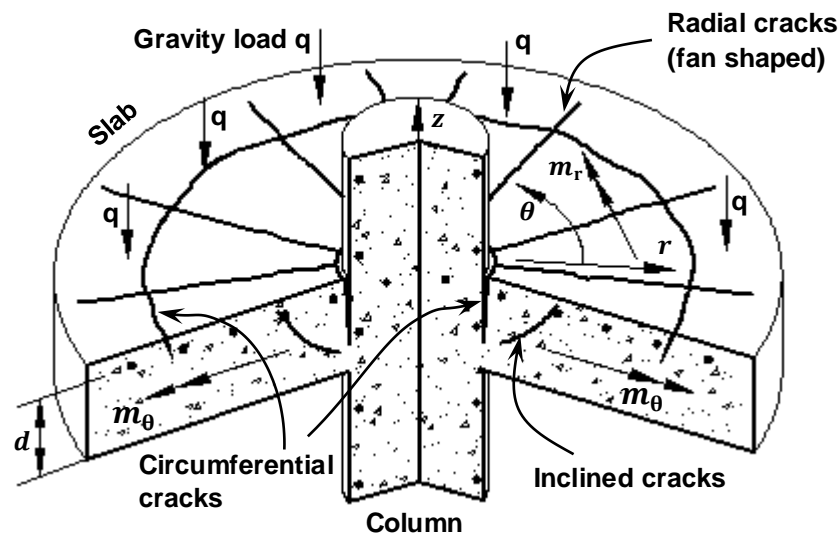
Typical cracks and bending moments at slab-column connections<sup>[20]</sup>
